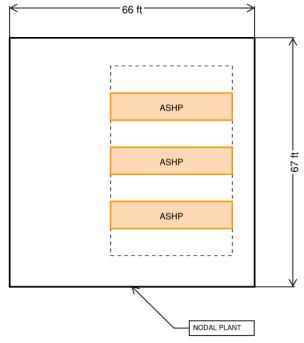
Area Footprint for Fairhaven and Ridgeway Nodal Plant
